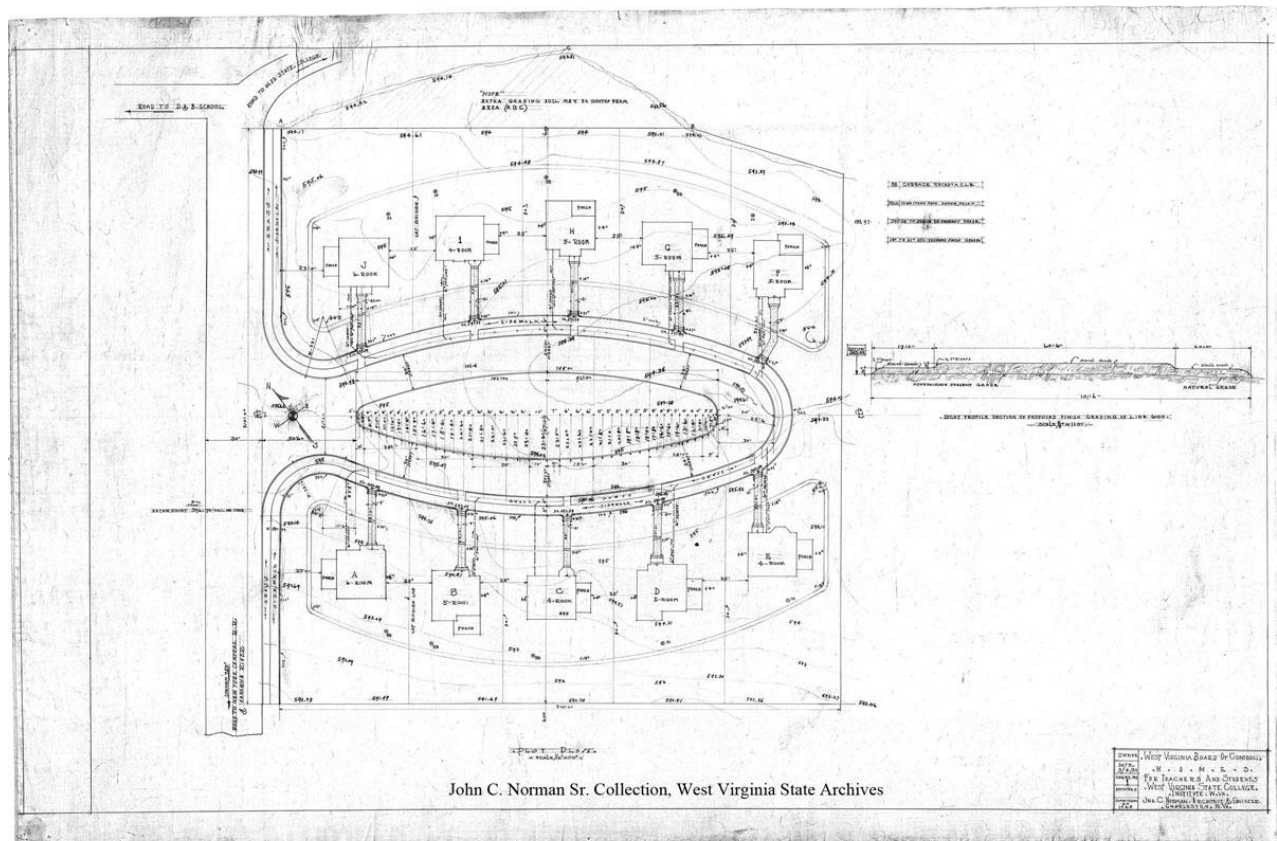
Site plan for the Faculty House, West Virginia State Archives
